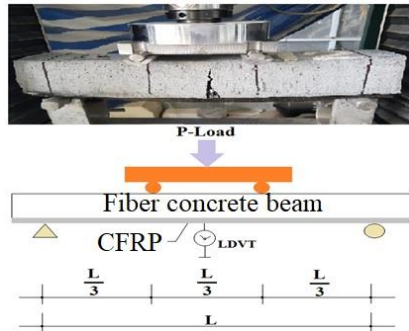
Preparation of reinforced fiber concrete beams for 4-point loading operations
